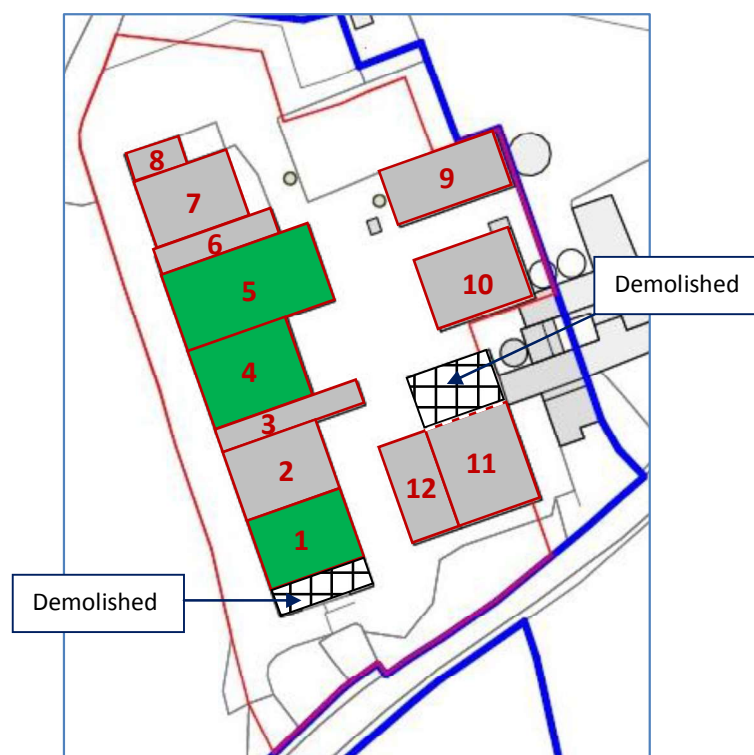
Building layout plan showing structures surveyed and scoping survey results (see key below).
